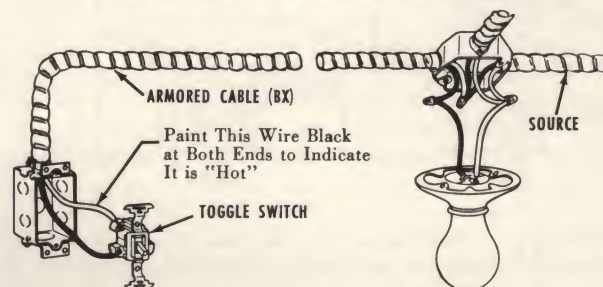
SWITCH ADDED FOR CEILING FIXTURE
